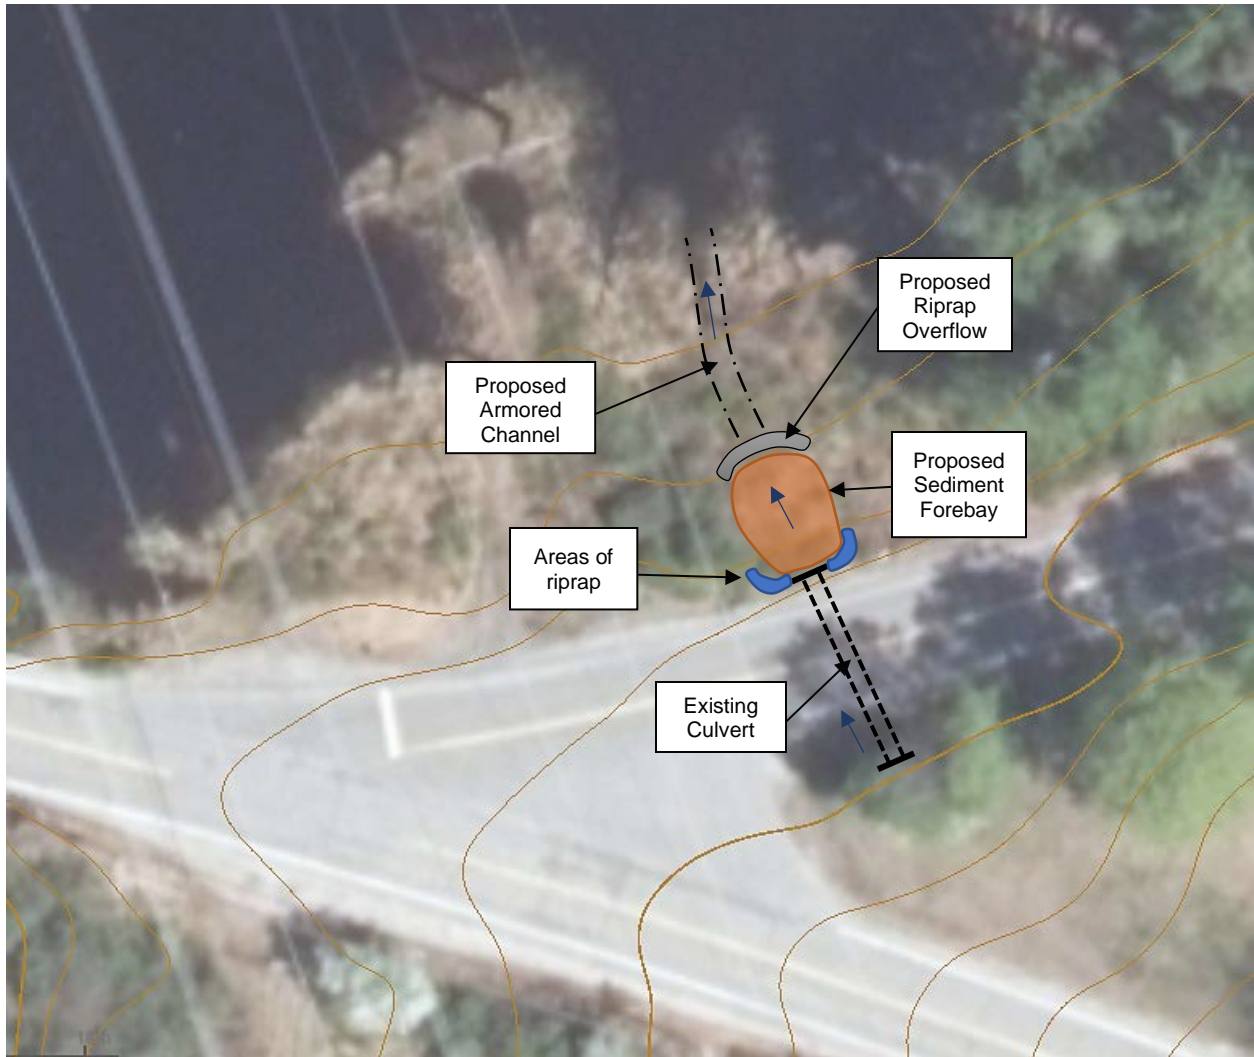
Proposed BMP configuration for intersection of Hopkinton Road and Currier Road.
